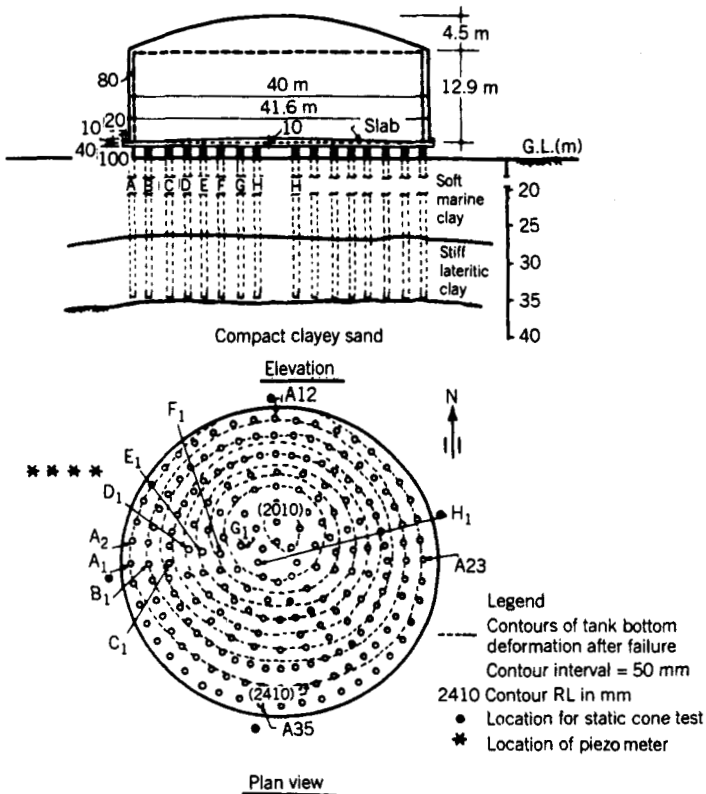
Details of tank used to store liquid ammonia. (From Mohan et al., 1978.)
